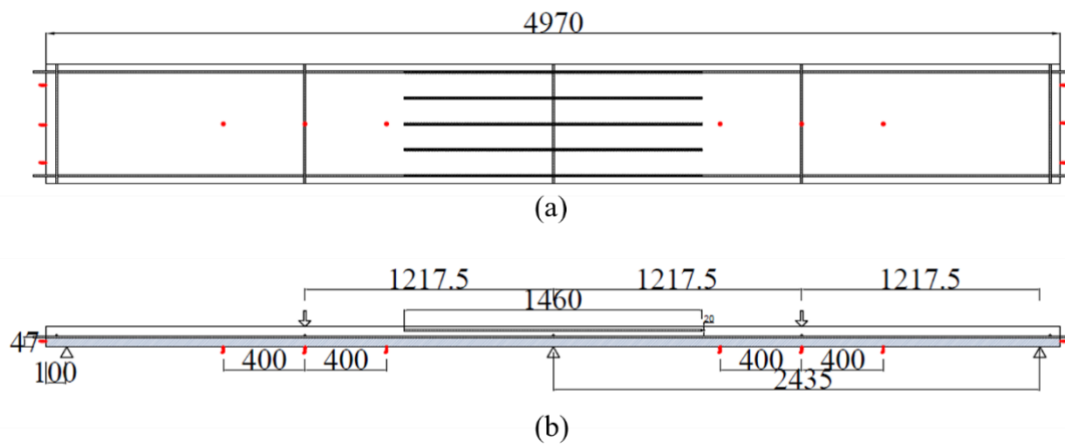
Continuous slab test: (a) plan, (b) elevation view.
